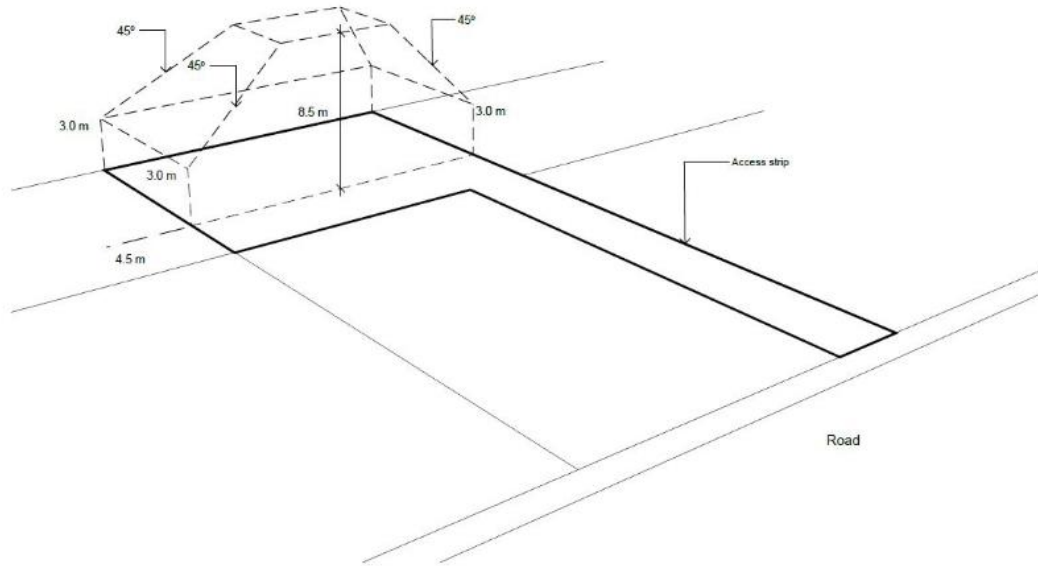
Building envelope for internal lots as required by clause 8.4.2 A3(a) and clause 8.5.1 A2(a)
